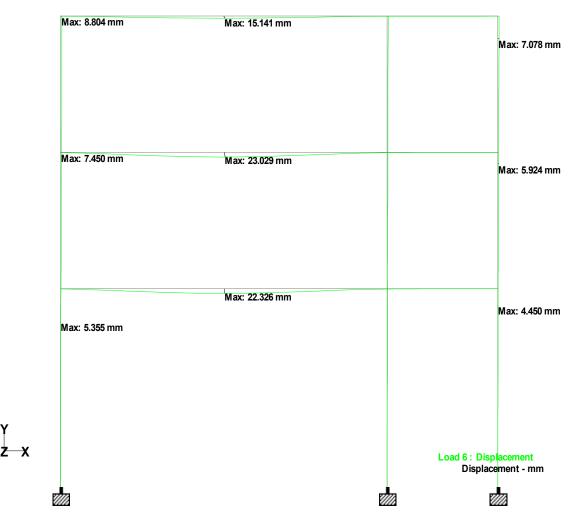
Deflection of a typical reinforced concrete frame (RC Frame 6) under loading without the retrofit
